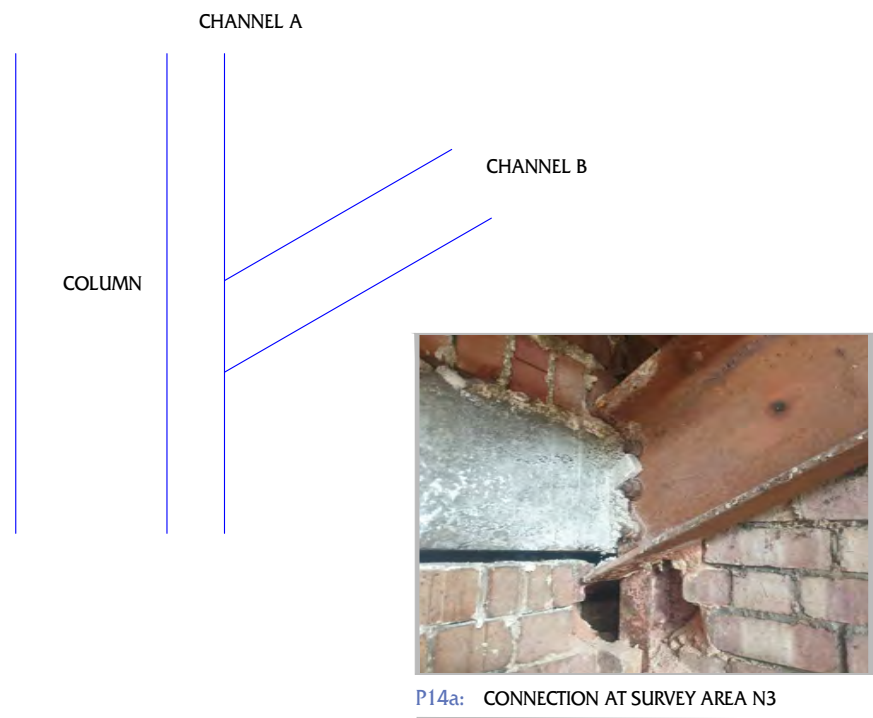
PART PLAN SHOWING SHOWING DETAILS OF PARTIALLY EXPOSED ROOF TRUSS ELEMENTS SURVEYED - SURVEY AREA N3 SCALE 1:10
